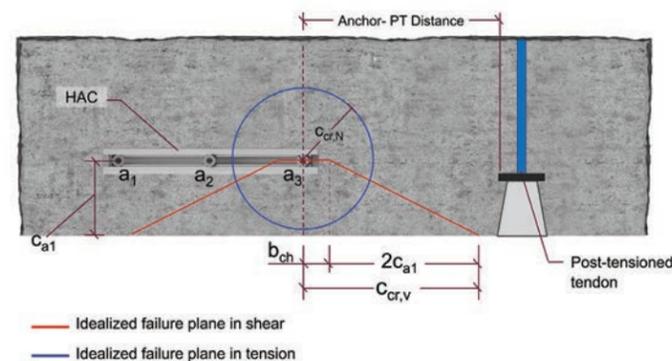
Top of slab configuration with live end of post-tensioned slab outside the anchorage zone.
